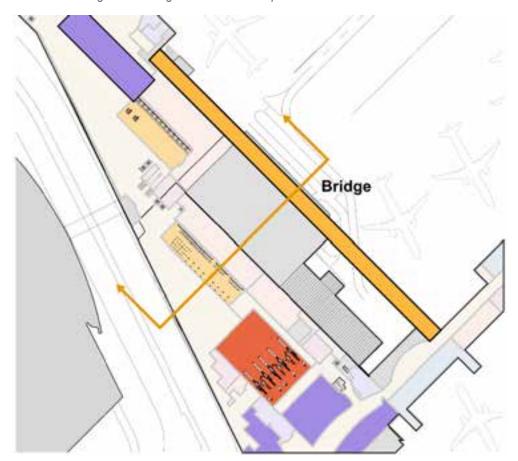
Enlarged Plan View – Departures Level A+B Connector
